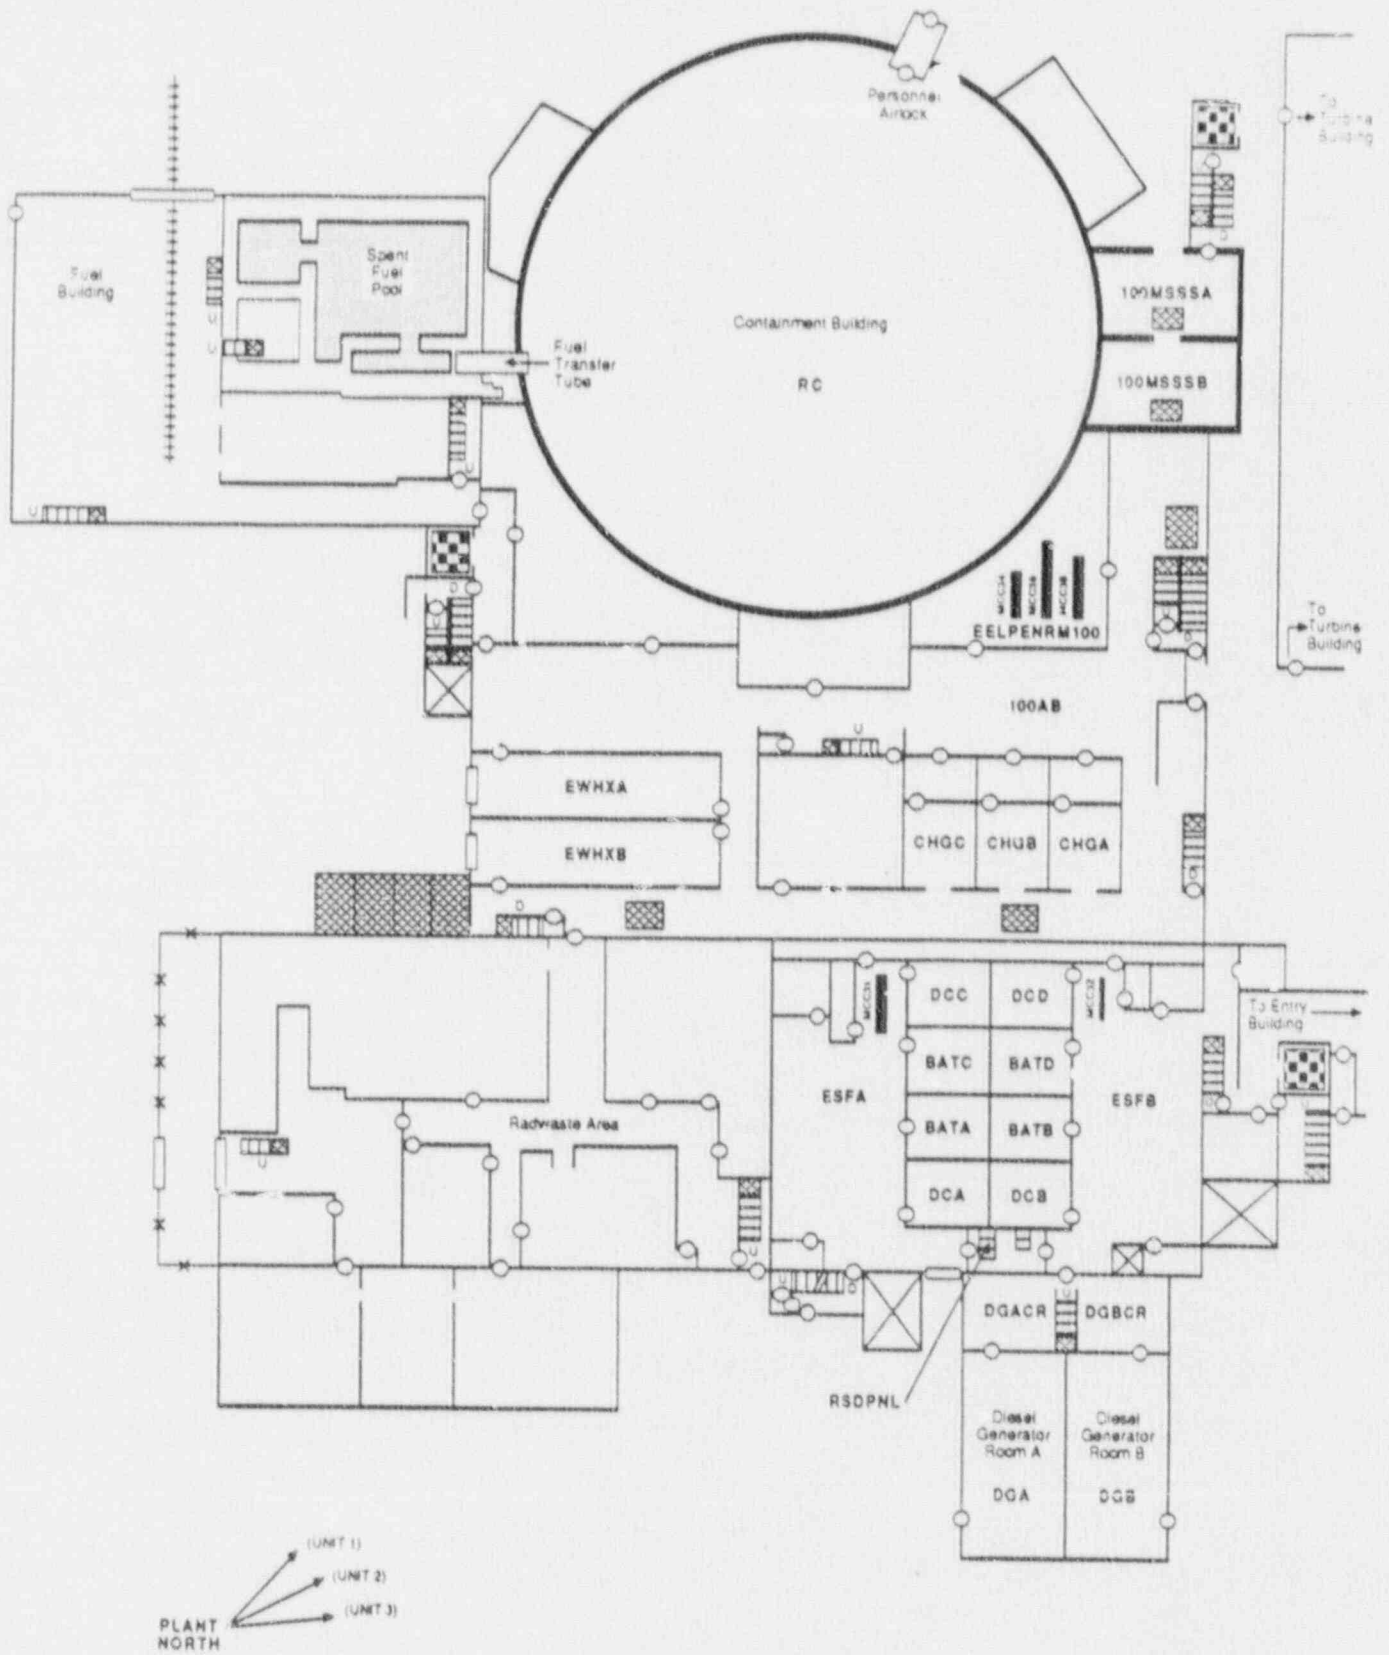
Palo Verde Power Block (Except Turbine Building), 100 ft. Elevation (Grade Level)
